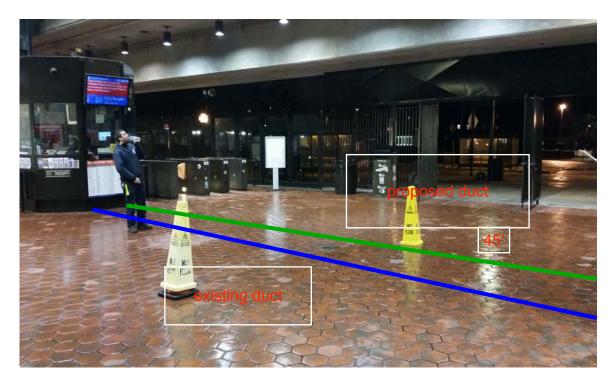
C12 Braddock Road: Existing duct run towards backroom corridor and proposed duct to proposed handhole.
